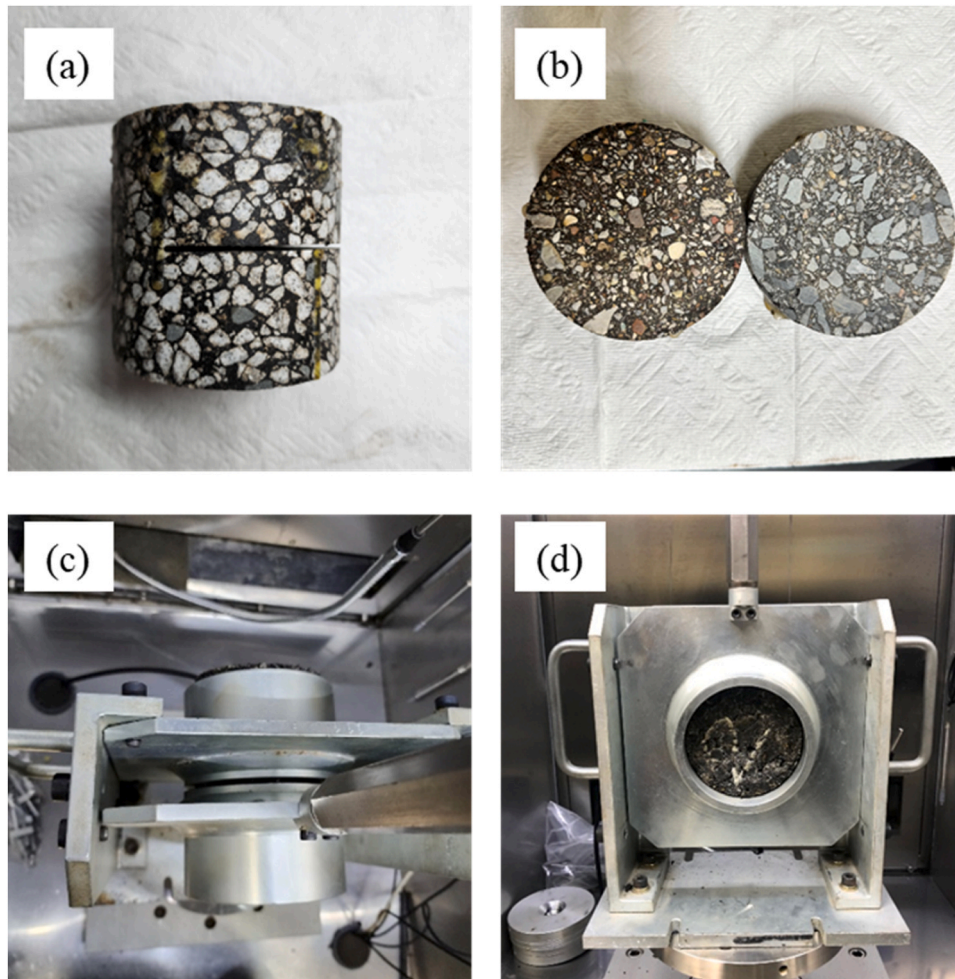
Type 1P sample (a), Type 2P sample, top view (c), and front view (d).
